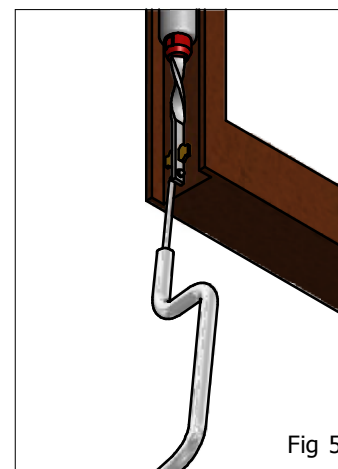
Latch the cross pin into the bracket seat and remove the tension tool. Finally check for a smooth operation of the sash.
